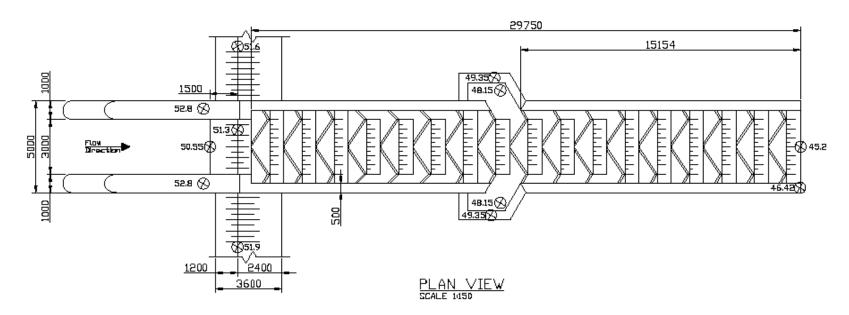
Plan layout drawing of the fishway-canoe chute as tested in the 1:15 scale model tests
